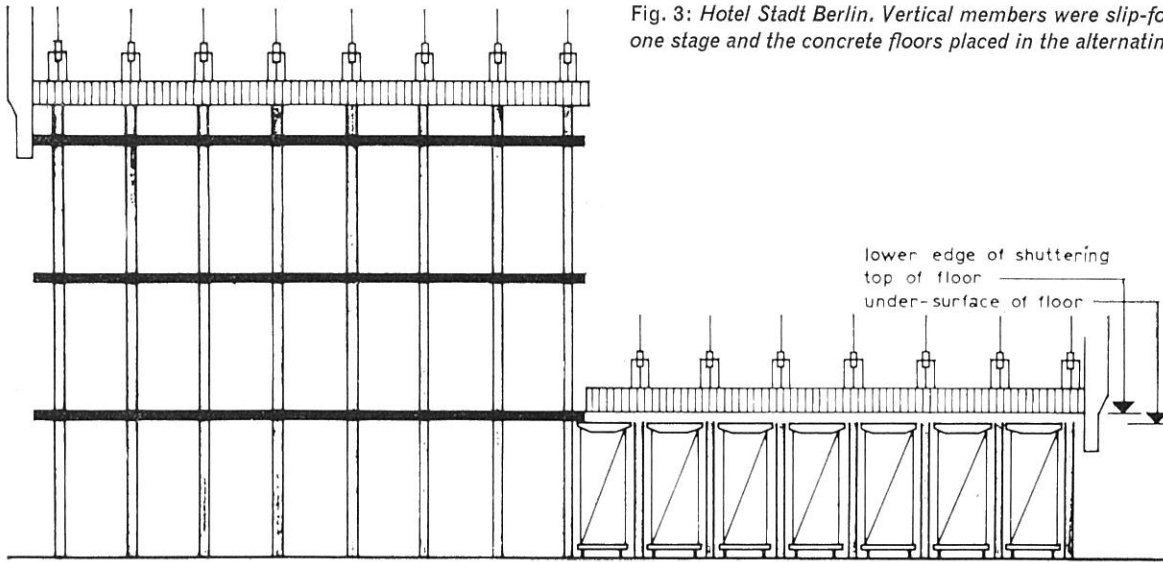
Hotel Stadt Berlin. Vertical members were slip-formed in one stage and the concrete floors placed in the alternating stage.
